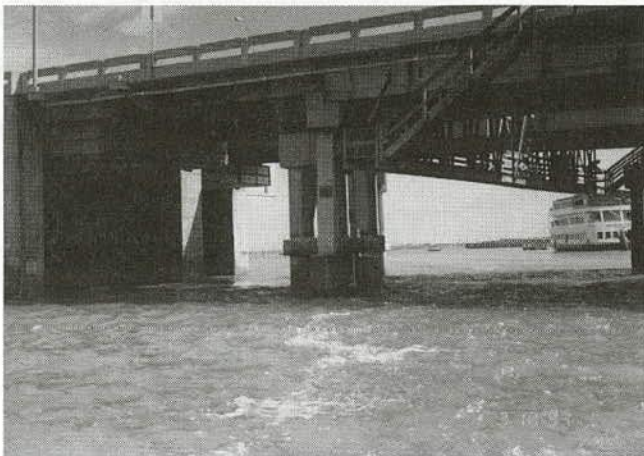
Crutch pile where the instrument was installed (Site FL1).
